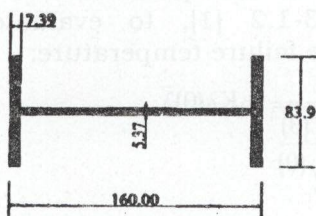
Cross-sectional dimensions of column (IPE 160).
